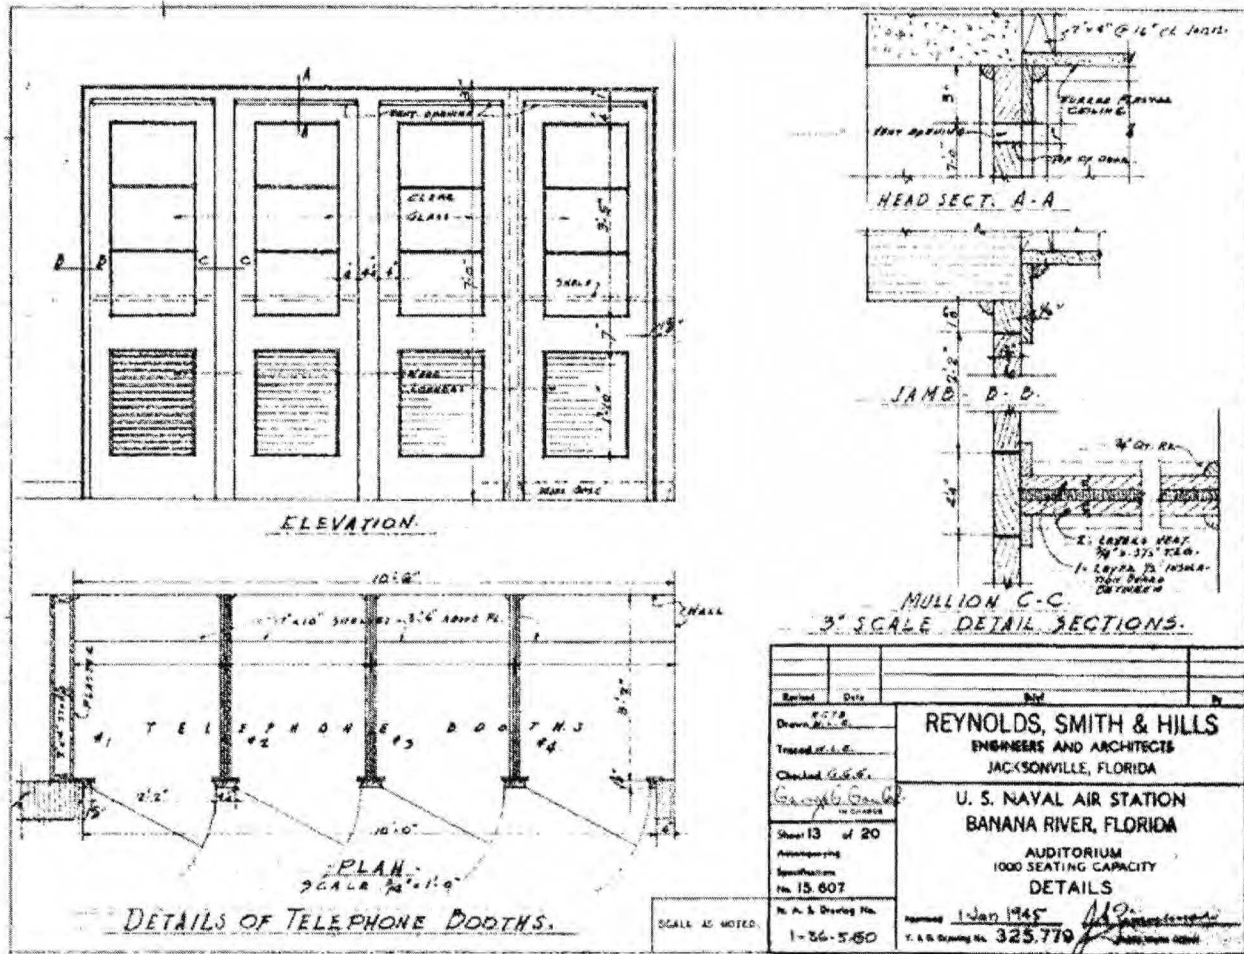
Elevation, Plan, and Detail of Original Lobby Phone Booths. (Y&D Drawing No. 325-779)
